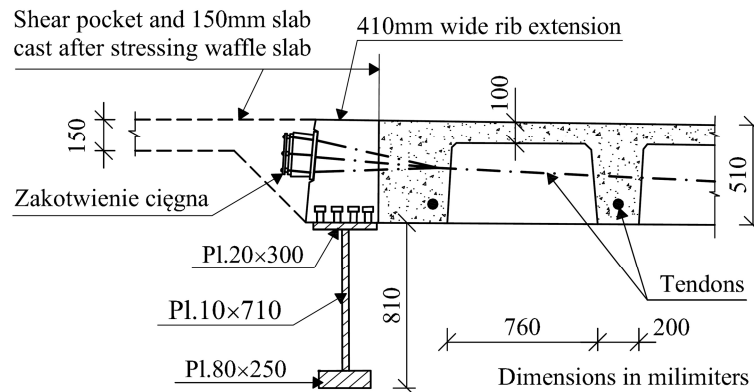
Section through plate girder at stressing end (Pretzer 1972).
